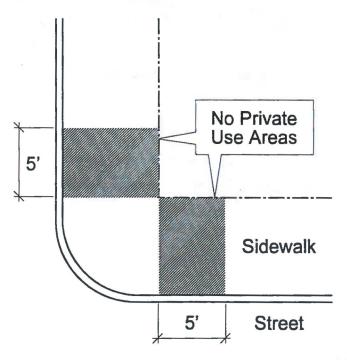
No Private Use Area (adapted from the Portland Pedestrian Master Plan)
